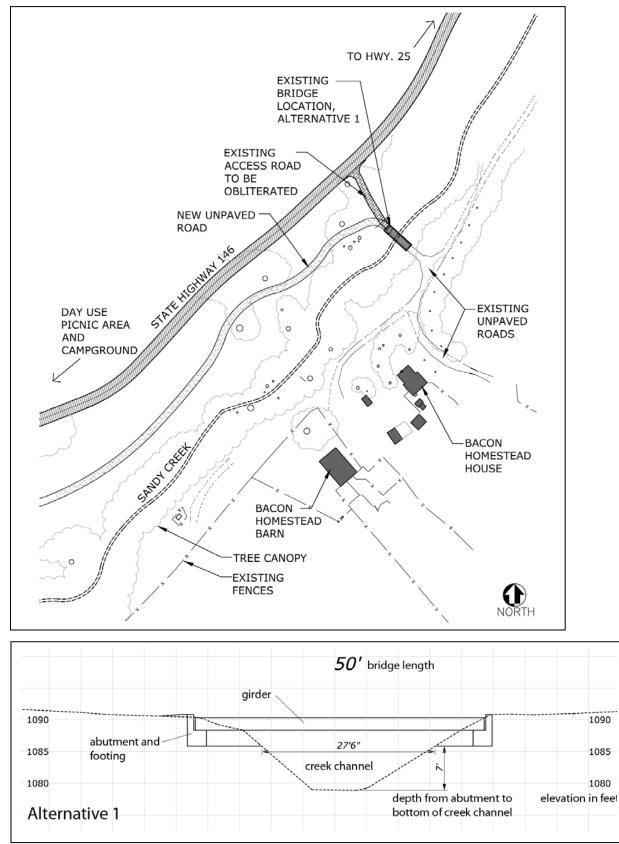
Alternative 1 Location Plan and Bridge Cross-section
